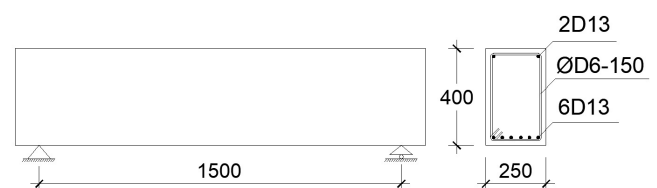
The cross-section of unstrengthened beam specimen, B0 (units in mm).
